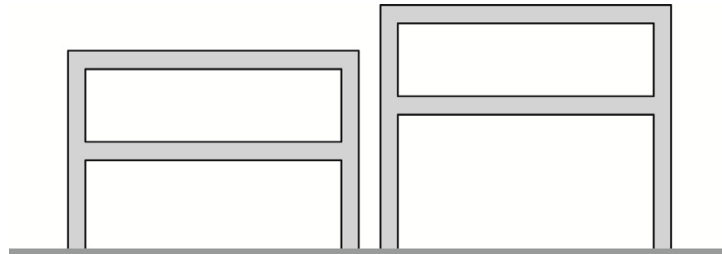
Floor to column configuration (from FEMA P-154 2015)
